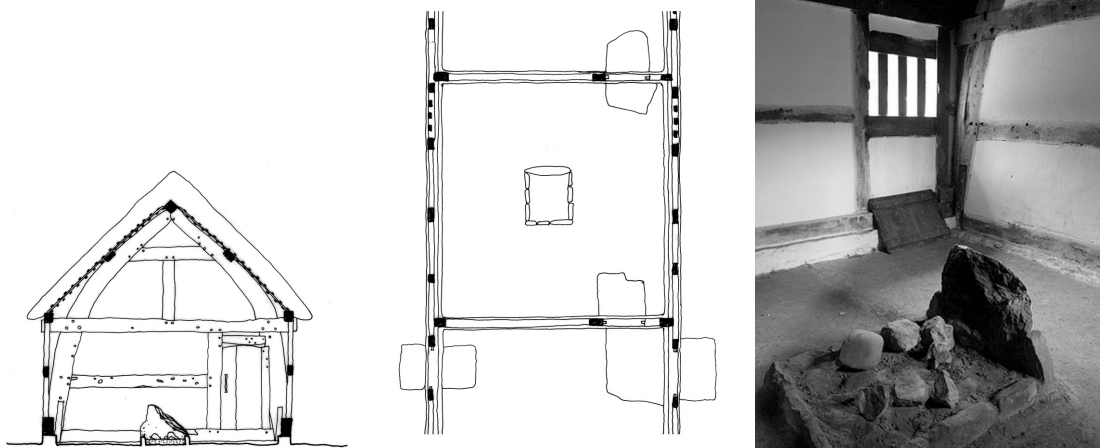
Section showing central hearth with stone fire back, *pentanfaen*, at Hendre'r-ywydd Uchaf, St.Fagans; Fig 7.66 Plan showing central hearth; Fig. 7.67 Photograph of Hendre'r-ywydd Uchaf
